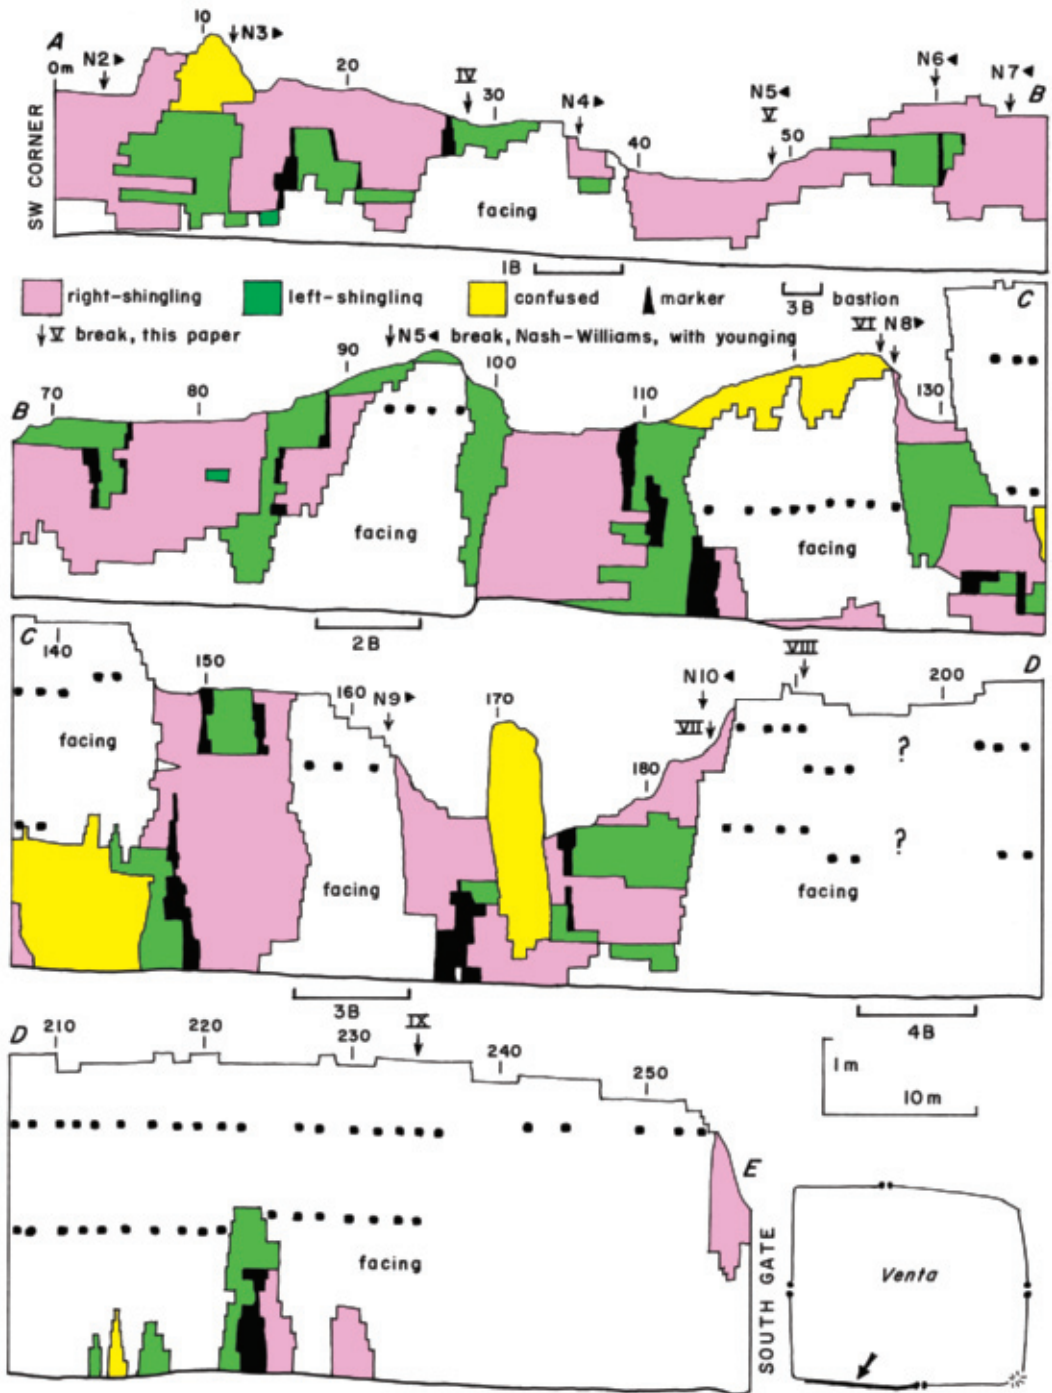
South Wall (West) at Caerwent, from the south-west corner to the South Gate.
